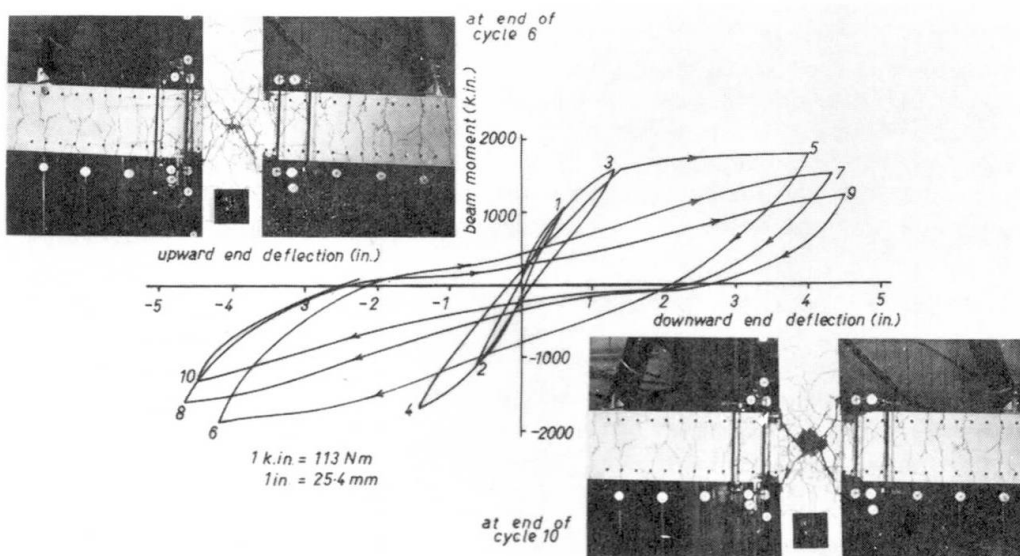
Unit 2 Beam Moment at Column Face versus Beam End Deflection
